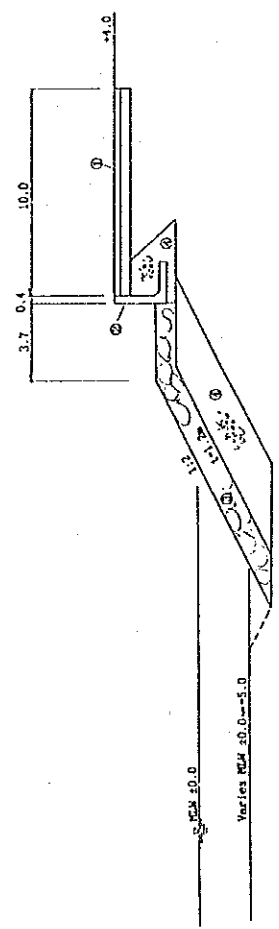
Seawall : MLW +0.0 - -5.0m
